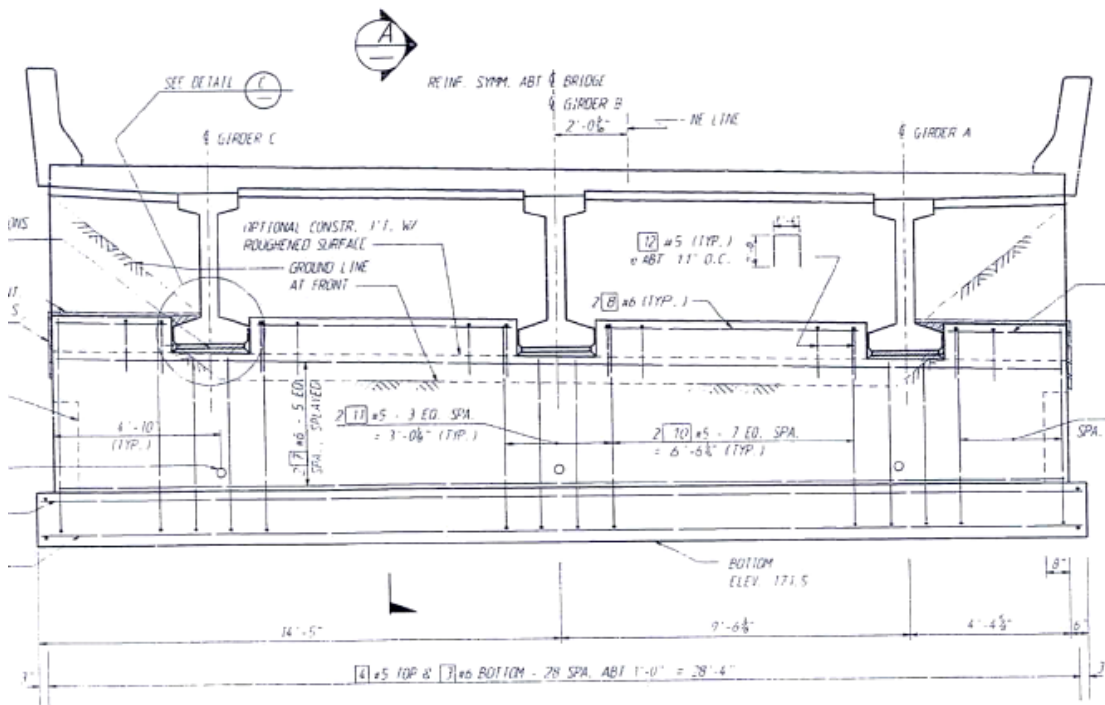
Bridge 405 Abutment and Deck Elevation View
